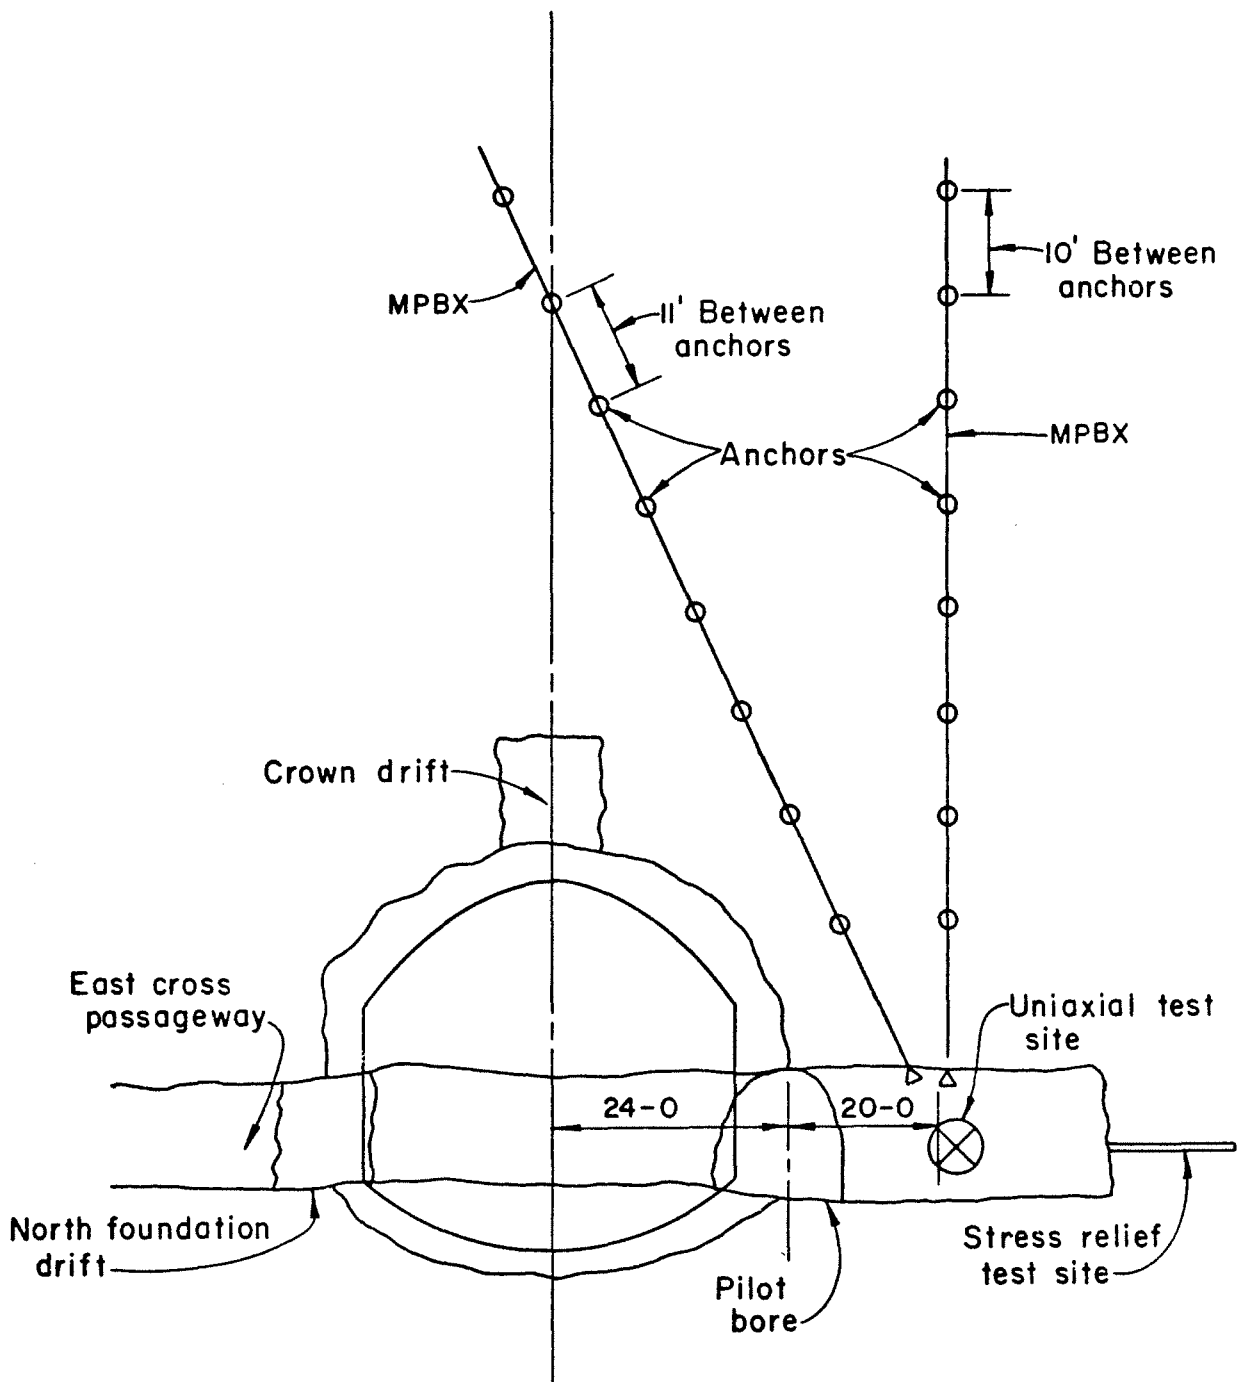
GENERAL PLAN OF TEST AND INSTRUMENTATION LOCATIONS IN ADITS AT STATIONS 101+70 AND 111+75
